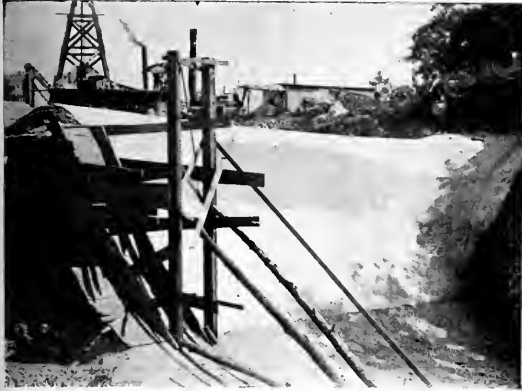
SECTION OF DAM, BULL'S BRIDGE.
